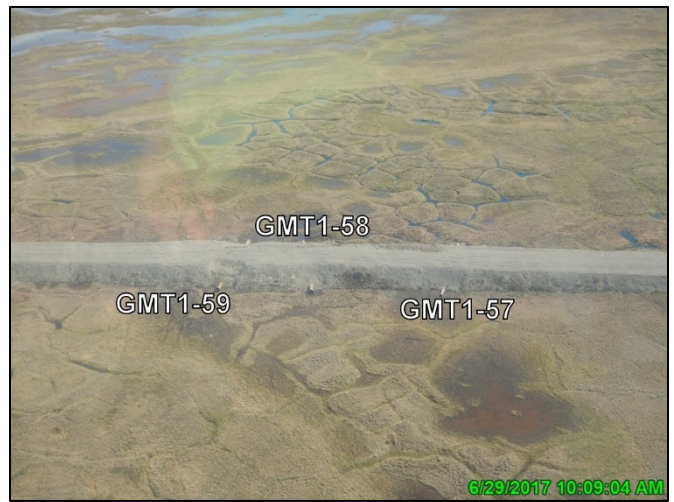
S3 culverts GMT1-57 through 59, looking east; June 29, 2017
